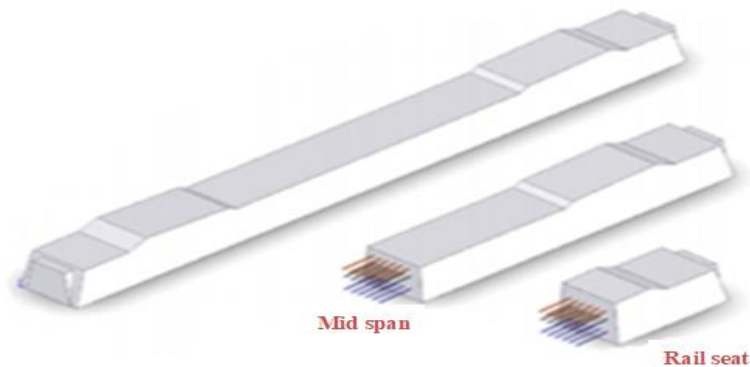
A monoblock prestressed concrete sleeper cross-section [37]
